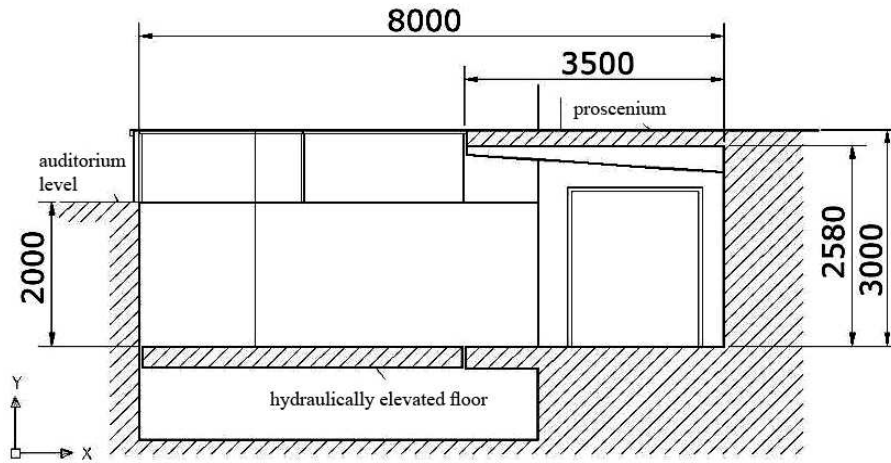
Cross-section of the orchestra pit in the Kraków Opera Hall.
